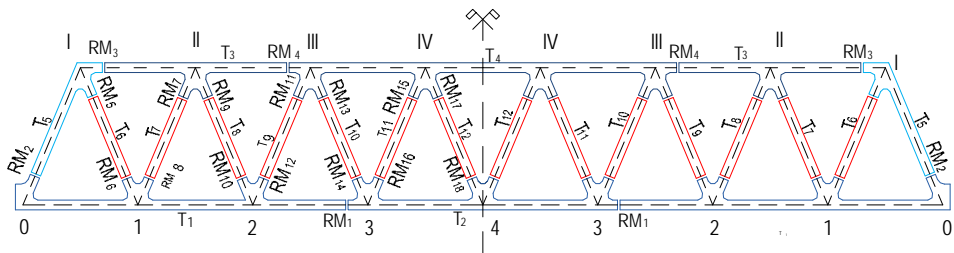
The placement of the mounting joints at a warren through truss girder.[3]
